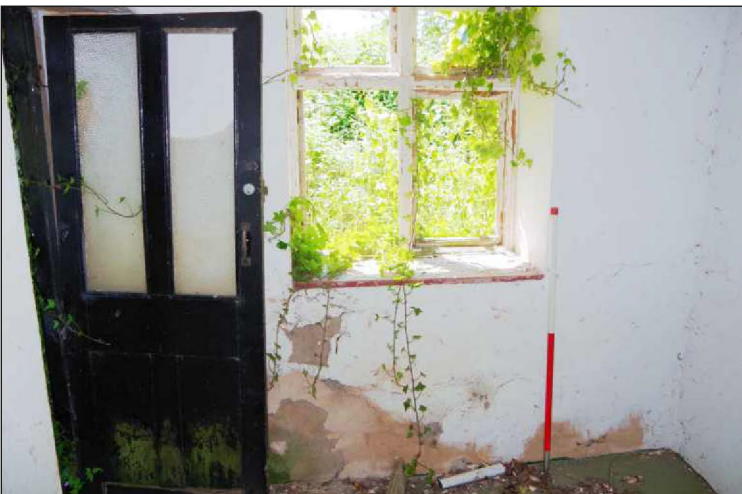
Room in the southeast corner of the outbuilding, looking south-southwest. (1m scale)
